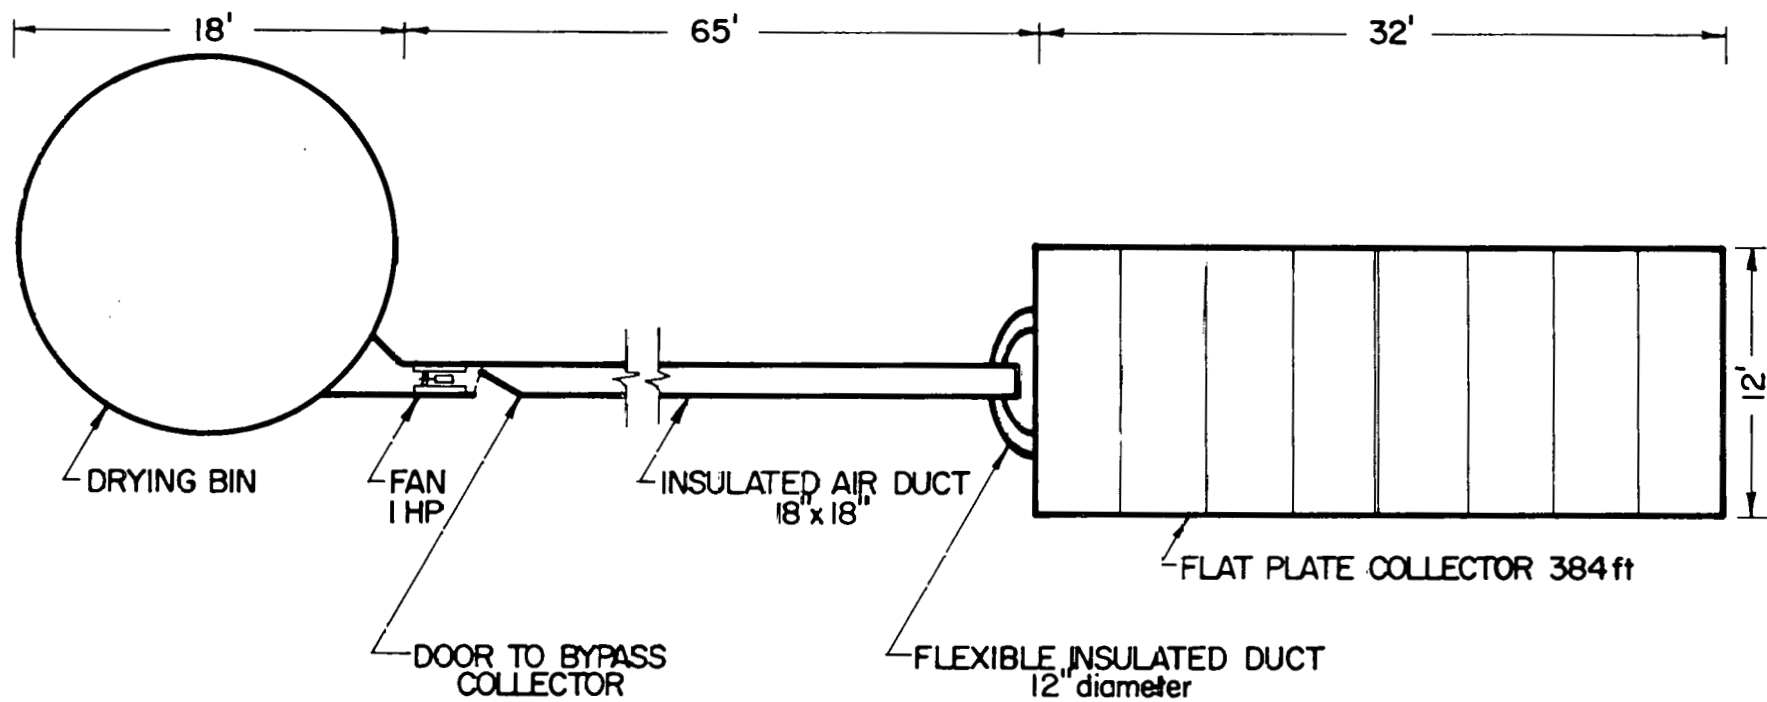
LAYOUT OF COLLECTOR, DRYING BIN AND AIR HANDLING SYSTEM FOR SOLAR DRYING TESTS
